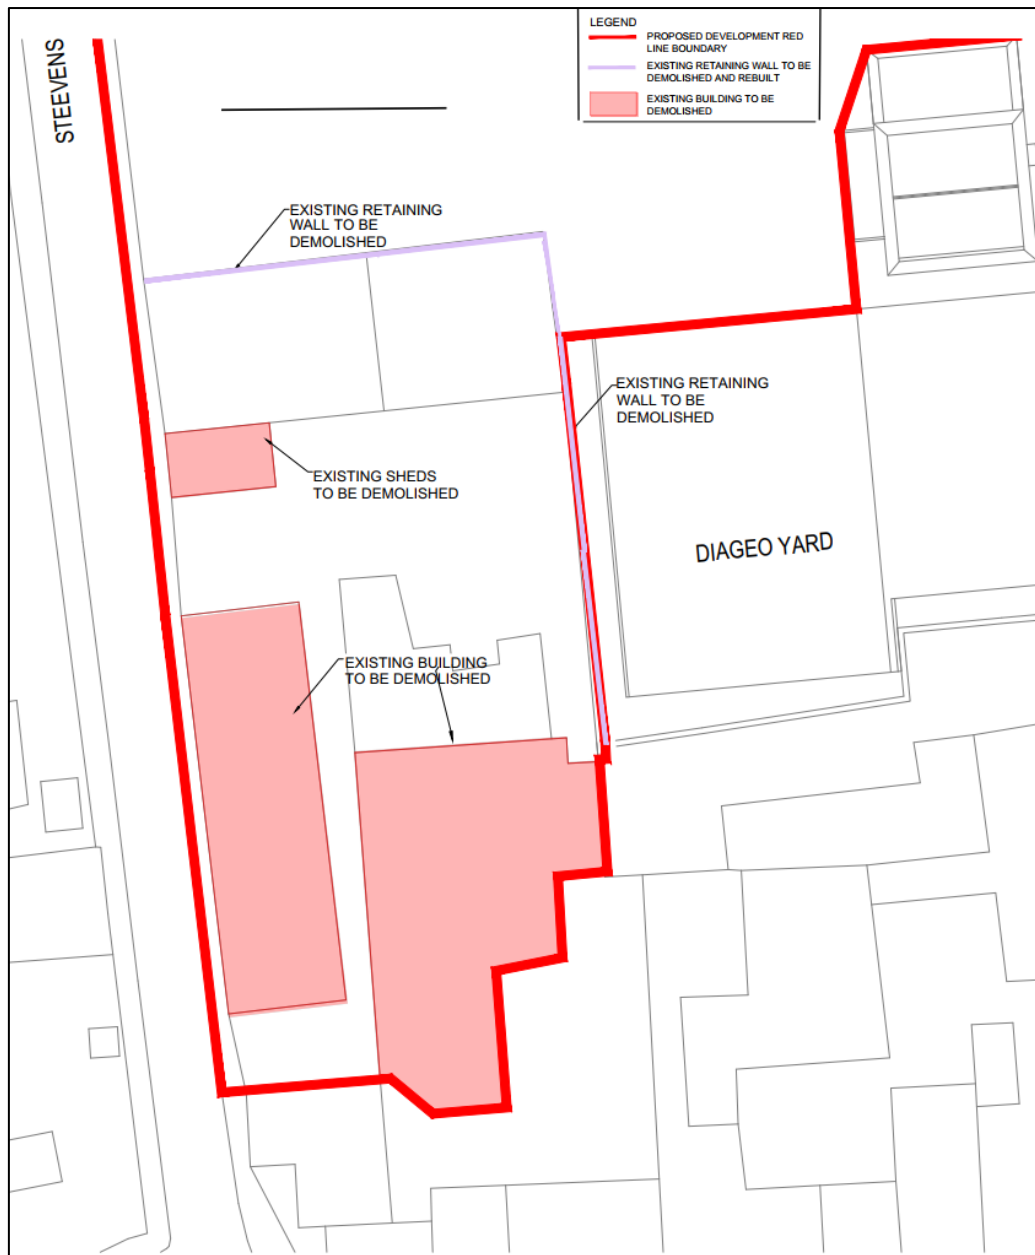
Existing buildings and retaining walls to be demolished within the proposed substation site.
